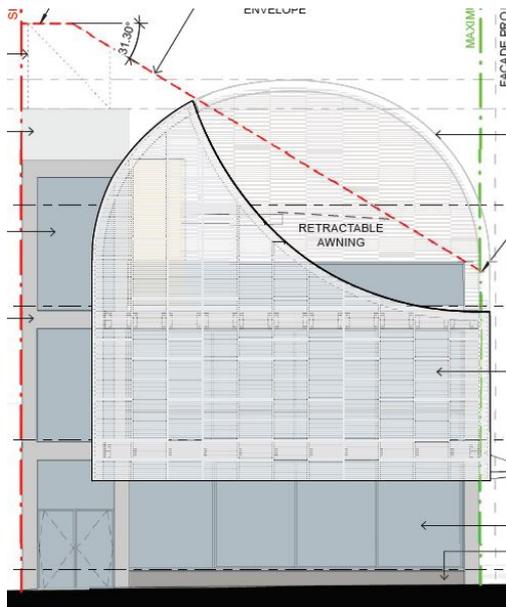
Commercial building western elevation with DCP sun angle shown in red.
